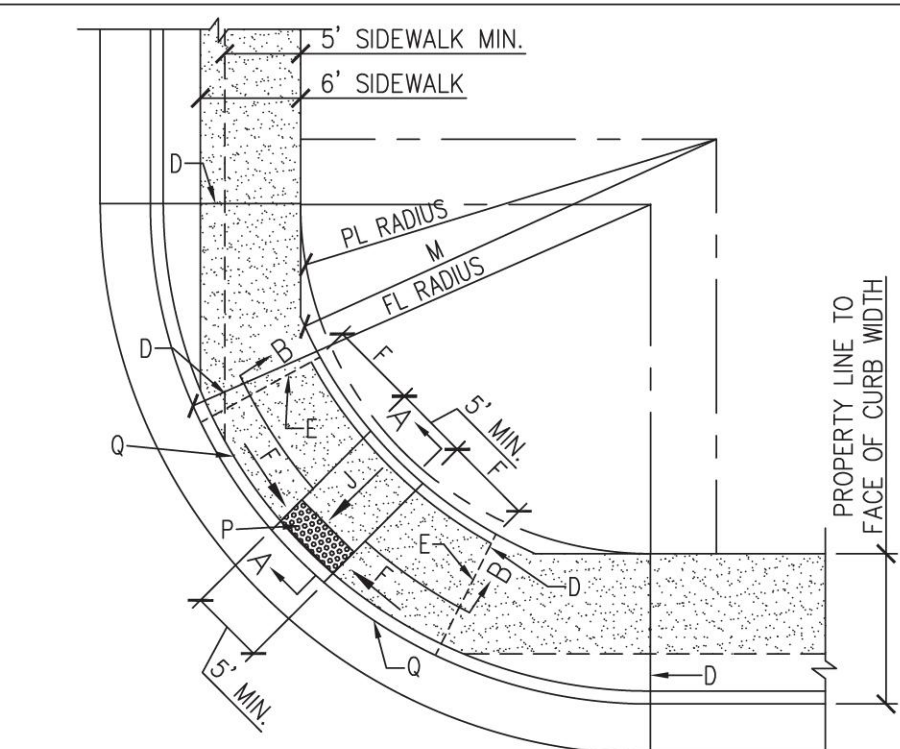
DETAIL A MINIMAL R.O.W. FOR SIDEWALK AT BACK OF CURB PERPENDICULAR RAMP
